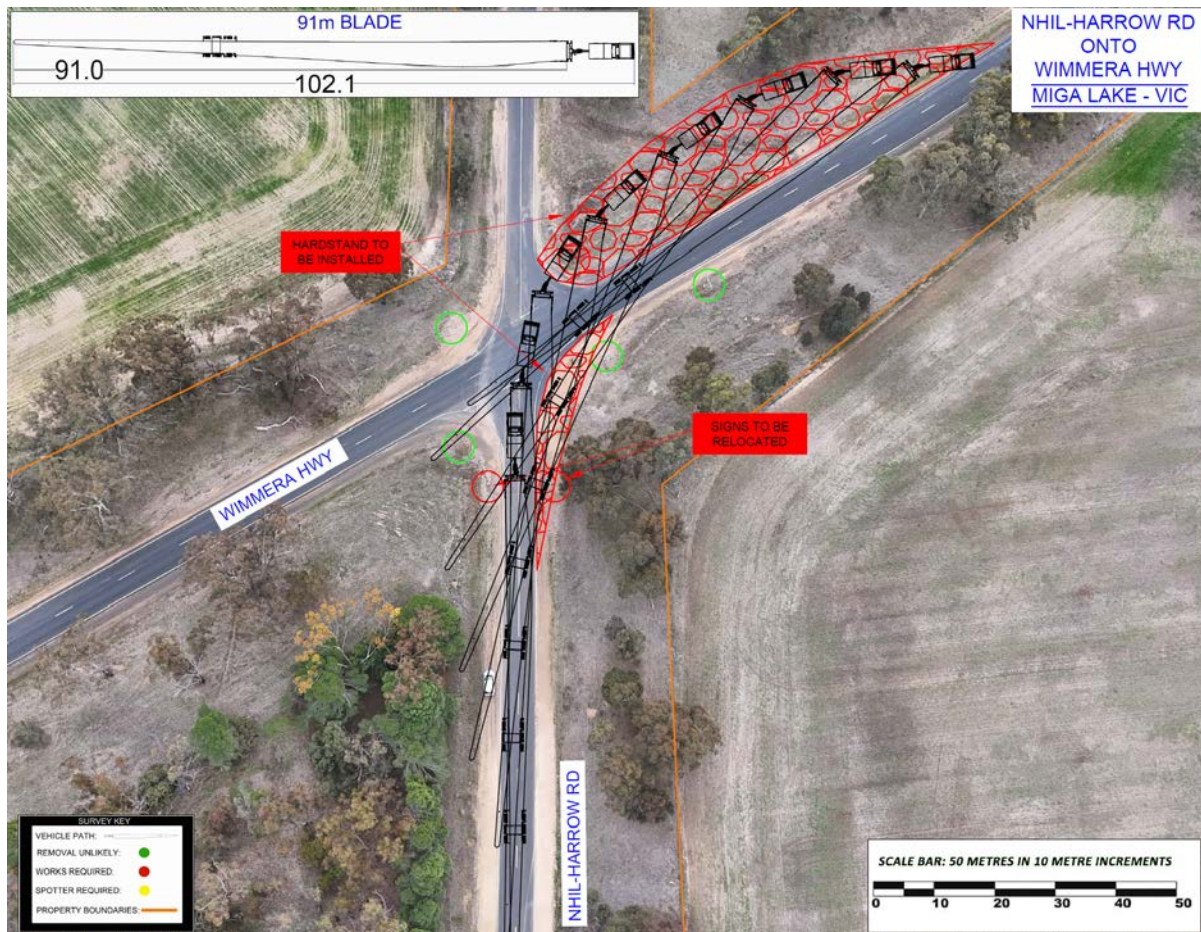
Nhil-Harrow Road onto Wimmera Highway
